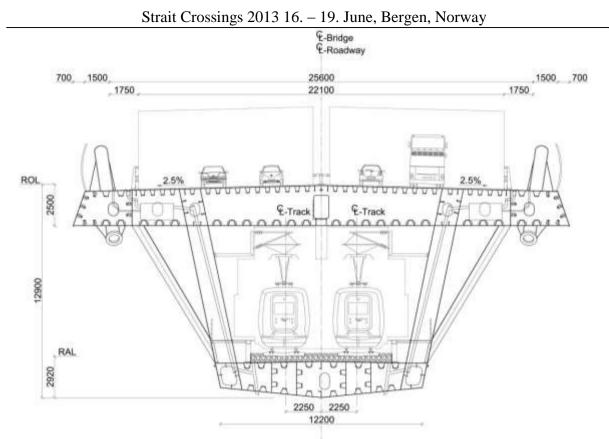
Fehmarnbelt Fixed Link, elevation of the Main Bridge.
